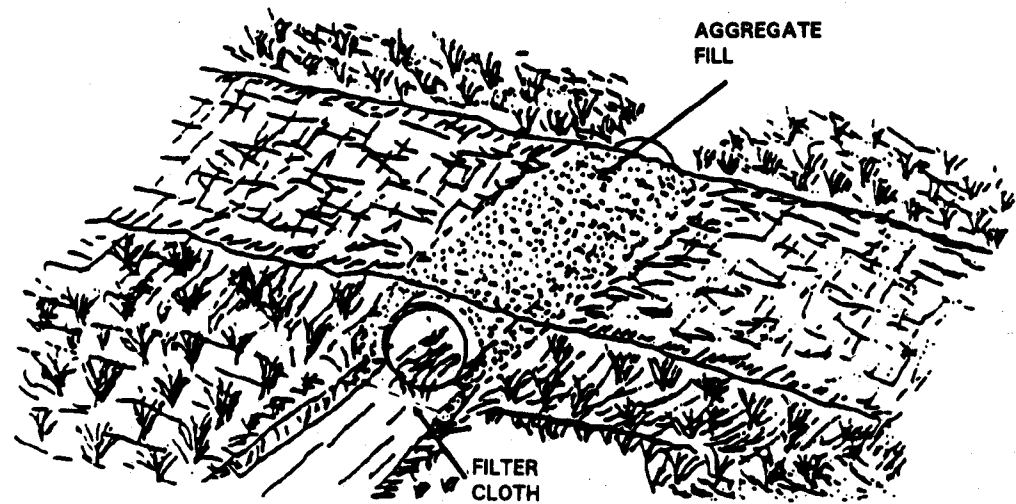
TEMPORARY ACCESS BRIDGE
